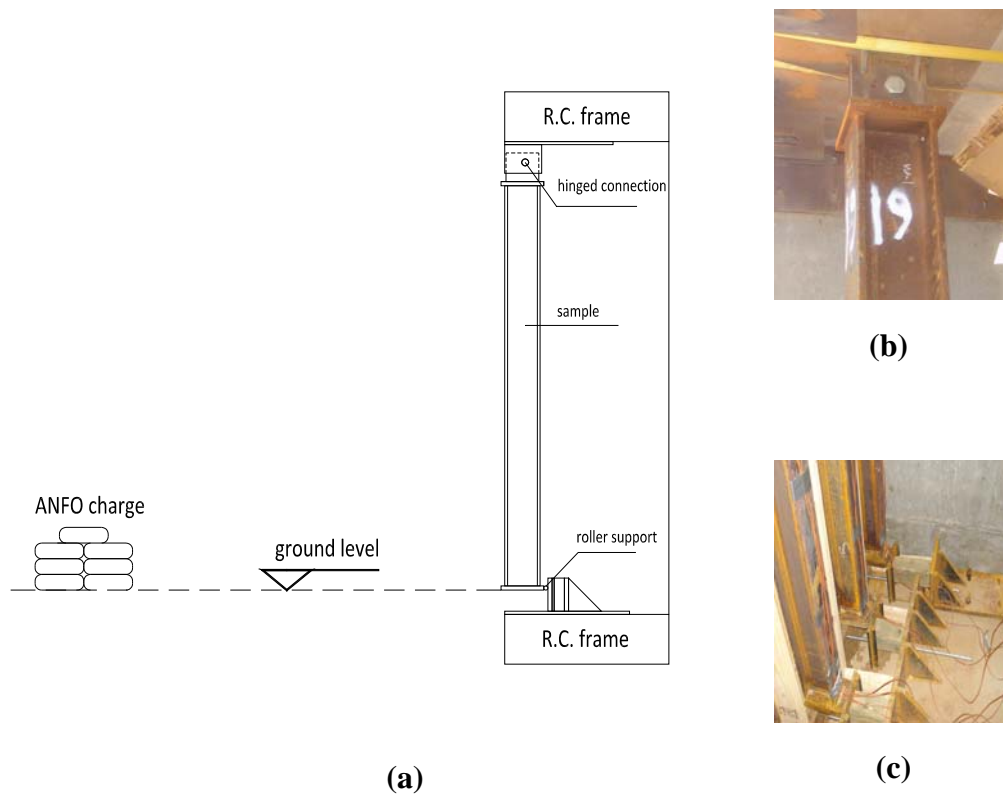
(a) Schematic view of charge location, (b) beam hinged end, and (c) beam roller end
